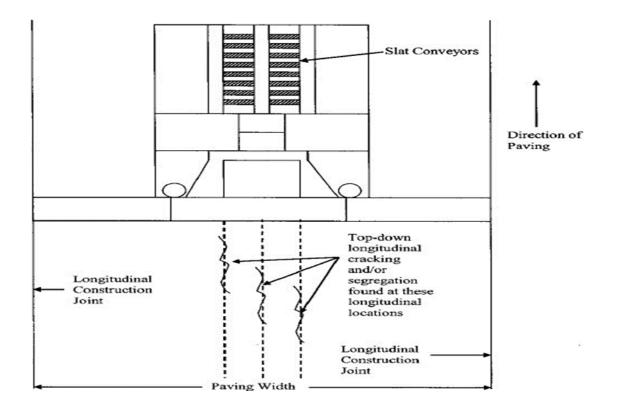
Paver top view and associated top-down longitudinal cracks (Harmelink et al.,
